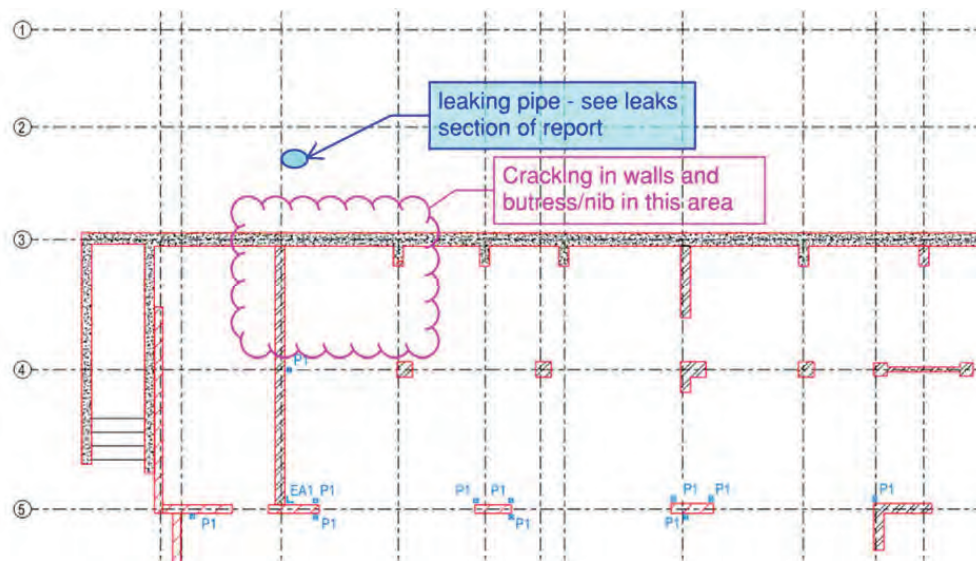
Plan excerpt showing cracking in corner and proximity of leaking pipe.
